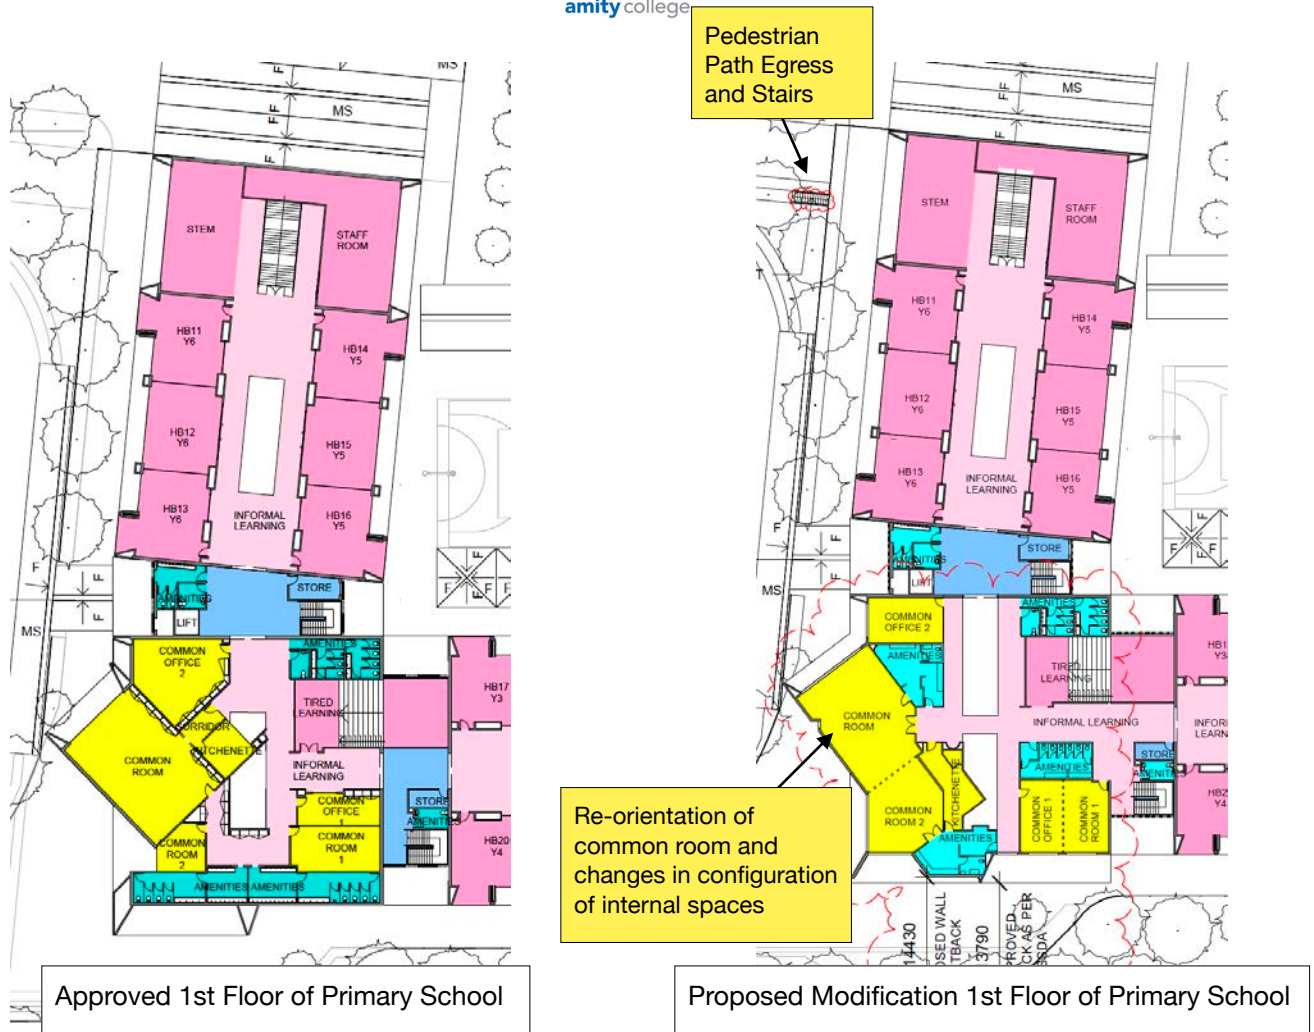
(above): Revised 1st Floor of Primary School compared to original approved DA plan. Minor changes changes
